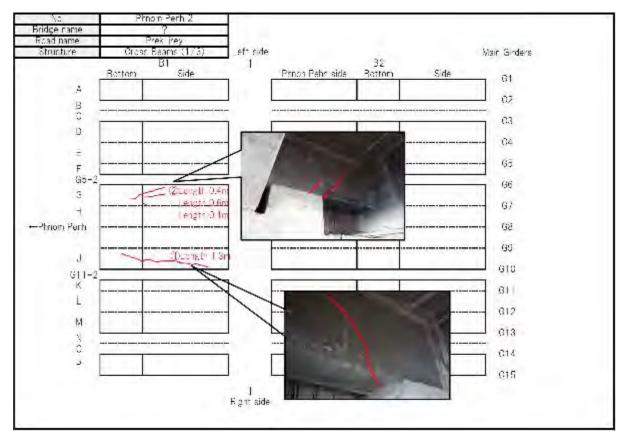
Inspection Sheet (Prek jrey: Phnom Penh. Bridge No. 2)
